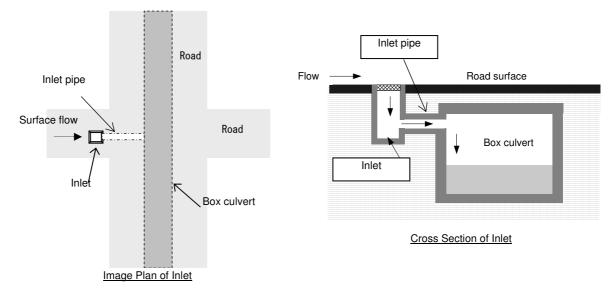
Image of Inlet and Inlet Pipe
